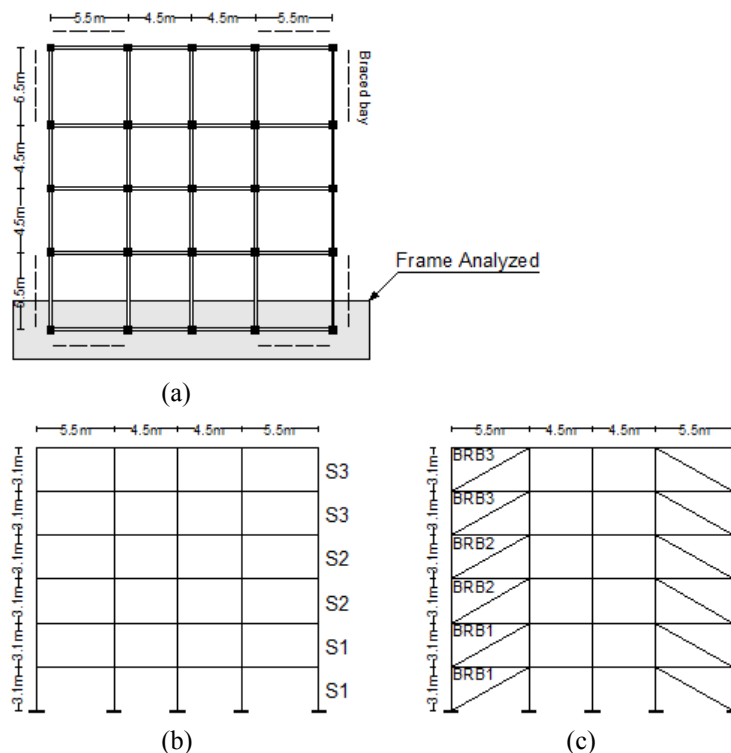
A layout for (a) a floor plan and (b) elevation of the original frame, and (c) elevation of the buckling restrained braced frames
